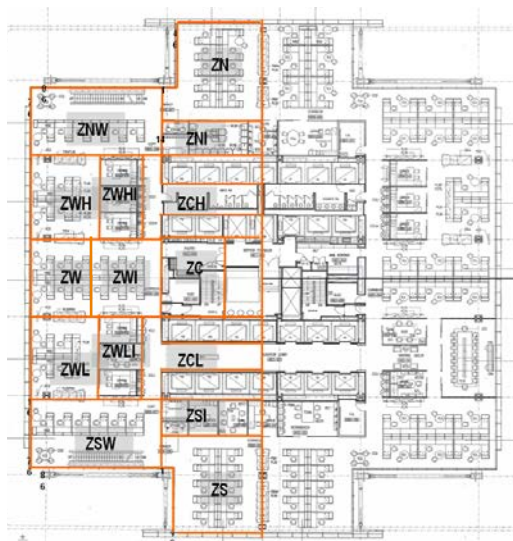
Typical Floor Plant; Half Floor Zoning.
